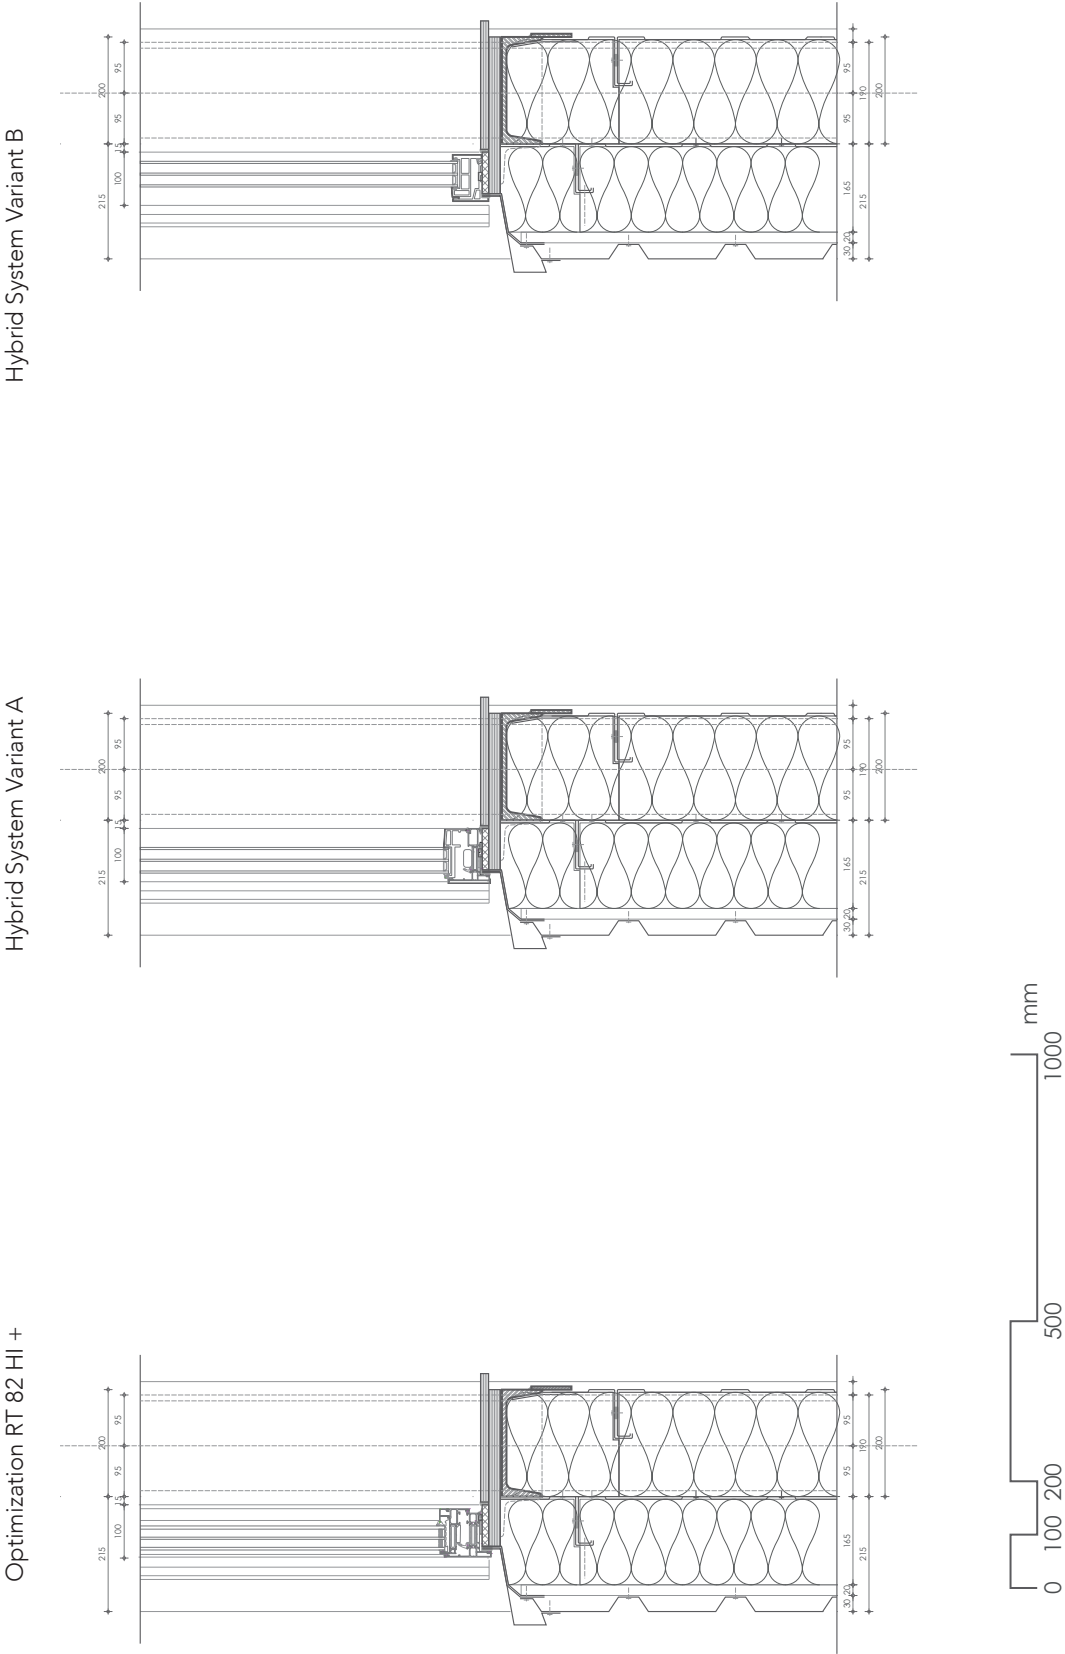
Vertical details of the three proposed designs attached to a passive house façade system and construction. Image by author.
